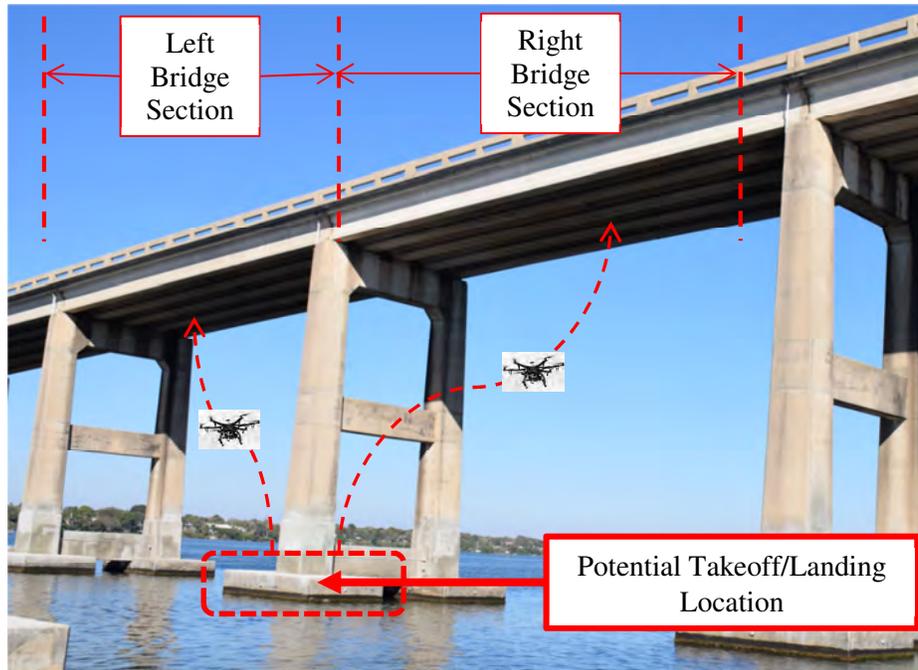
Hypothetical Bridge Inspection Site
